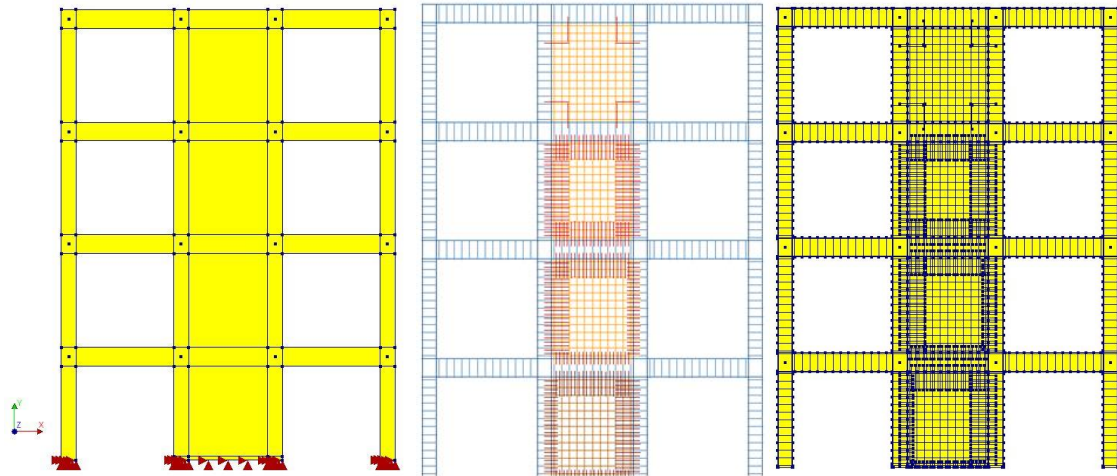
(a) Concrete geometry shapes of the FE model, (b) Embedded reinforcement bars for the existing frame and web reinforcements of the infill wall and dowels, (c) Complete geometry of the FE model
